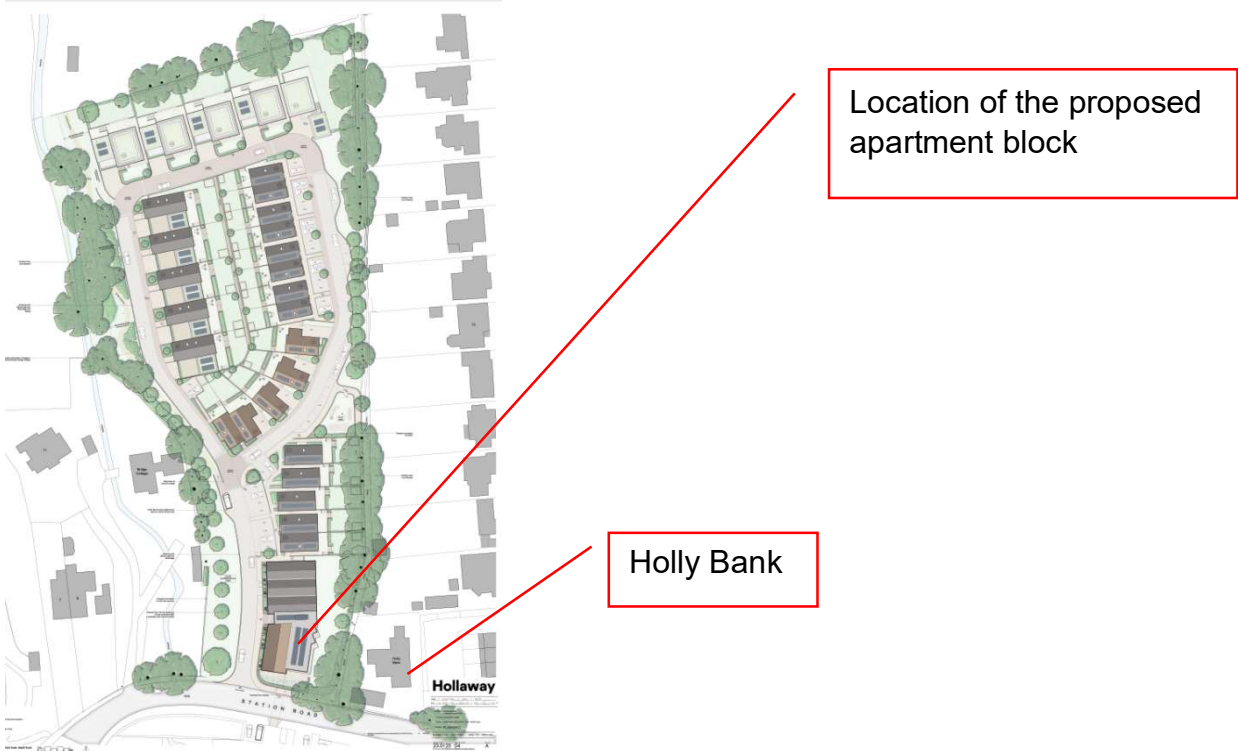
Proposed site layout and relationship of apartment block with Holly Bank
